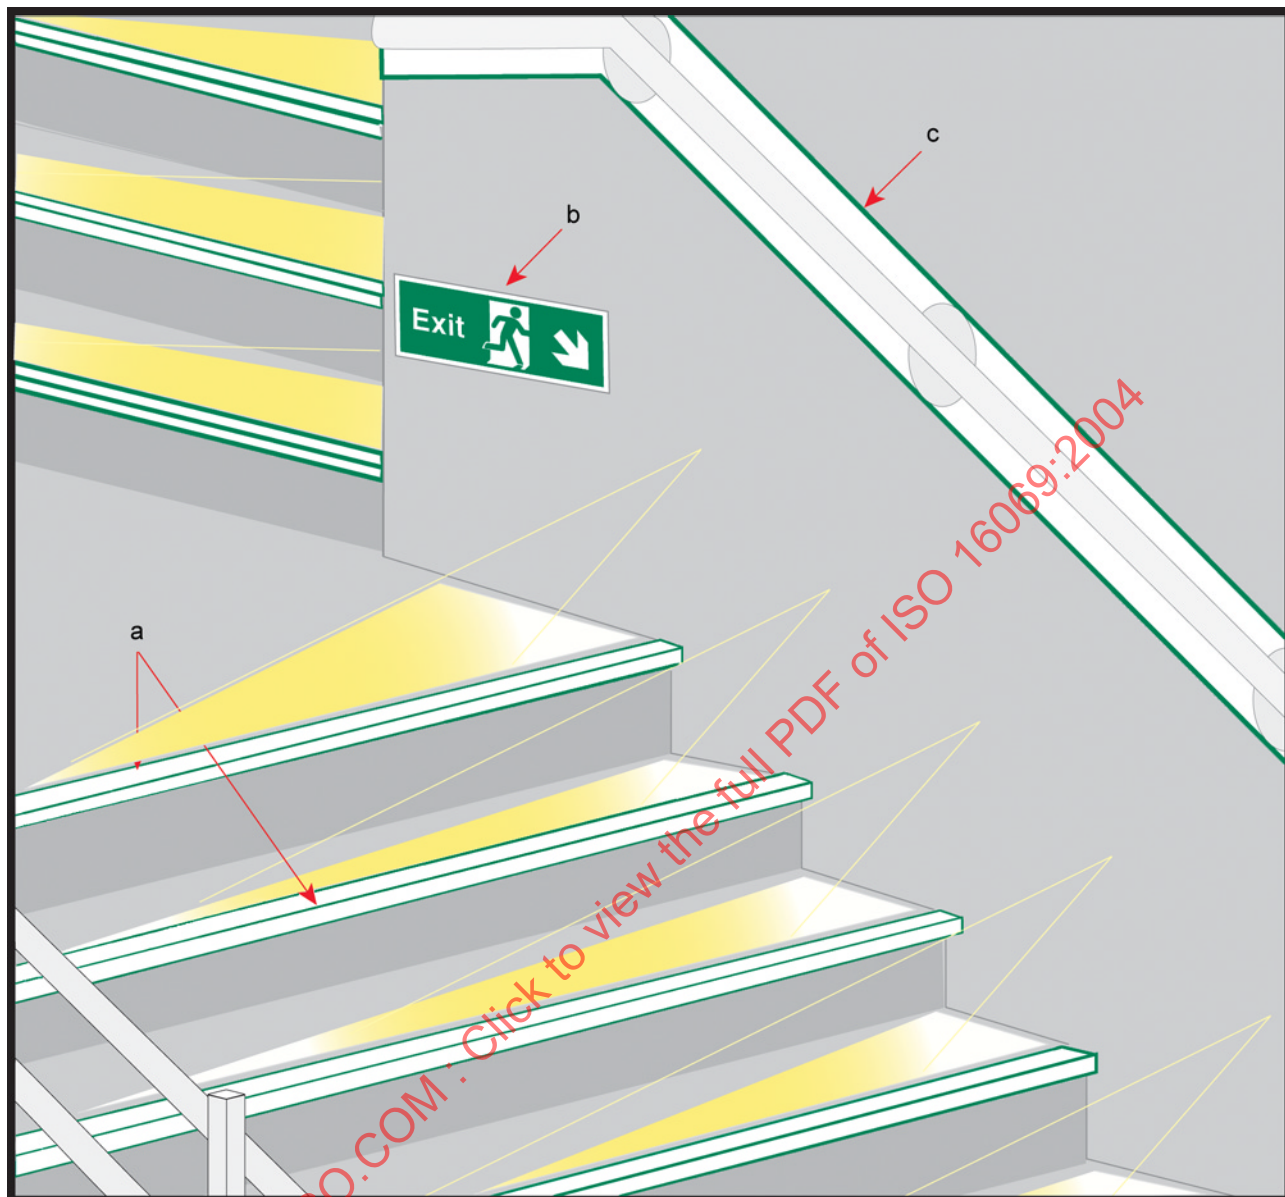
Example layout of a collection of different marking of stairs and handrails
